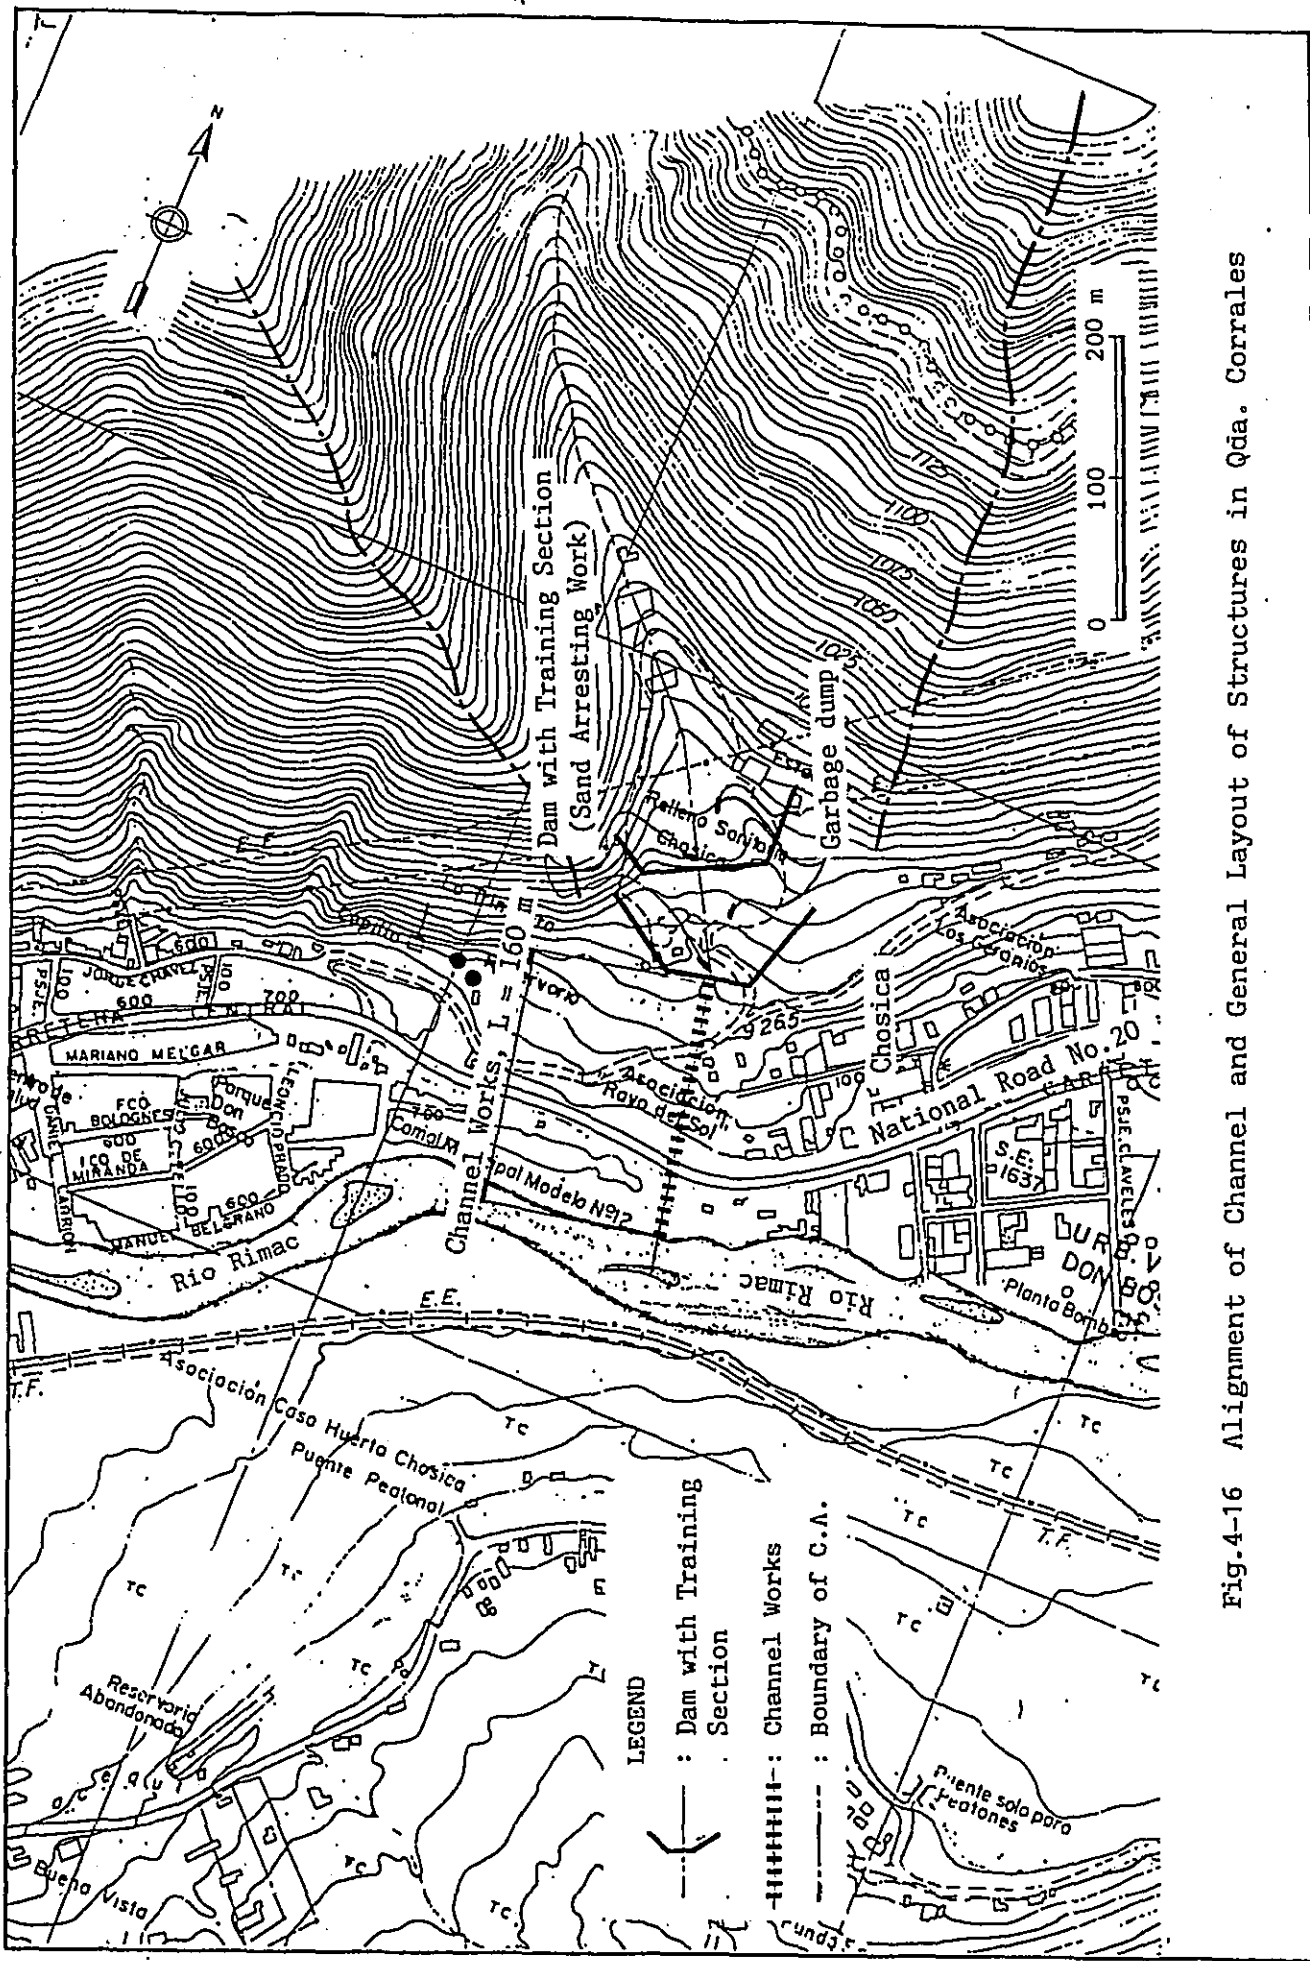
Alignment of Channel and General Layout of Structures in Qda. Corrales
